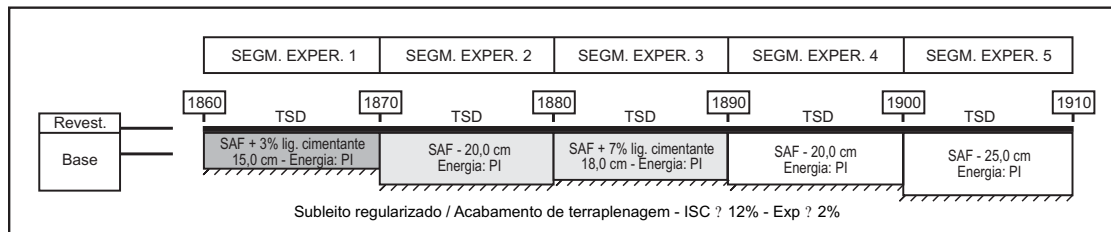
Pavements profiles of the experimental section of Campo Azul.
